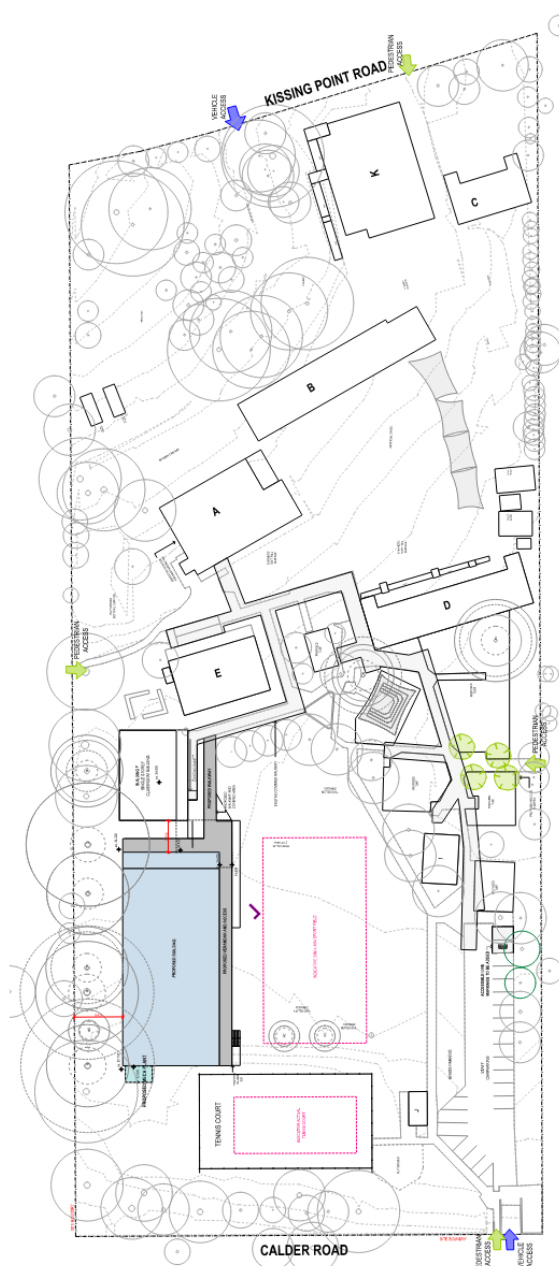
PROPOSED SCOPE OF WORKS (SOURCE: FULTON TROTTER ARCHITECTS, PROPOSED SITE PLAN)
